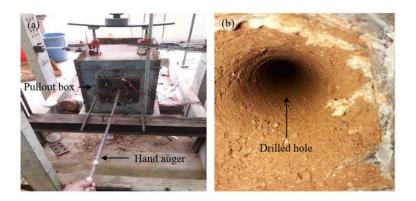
Drilling process (a) drilling a hole using a hand auger; (b) drilled hole
